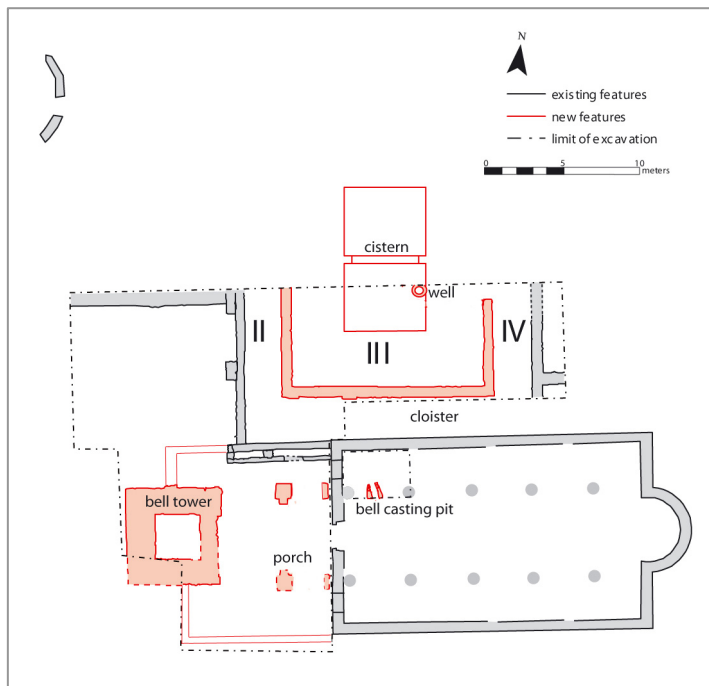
Plan of churchyard, bell-tower, porch, and earthen graves.
